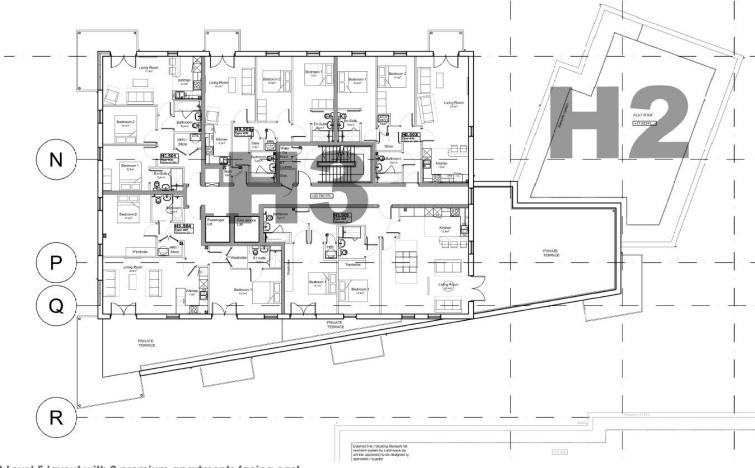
Revised IW H3 Level 5 layout with 2 premium apartments facing east
